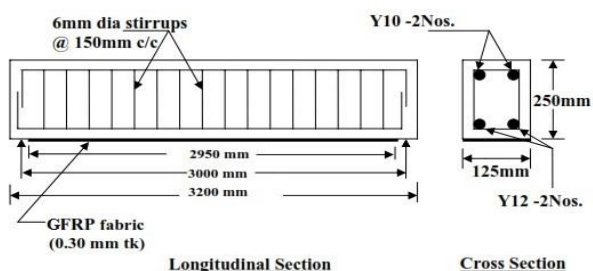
Reinforce arrangement of RC beam with GFRP sheet
